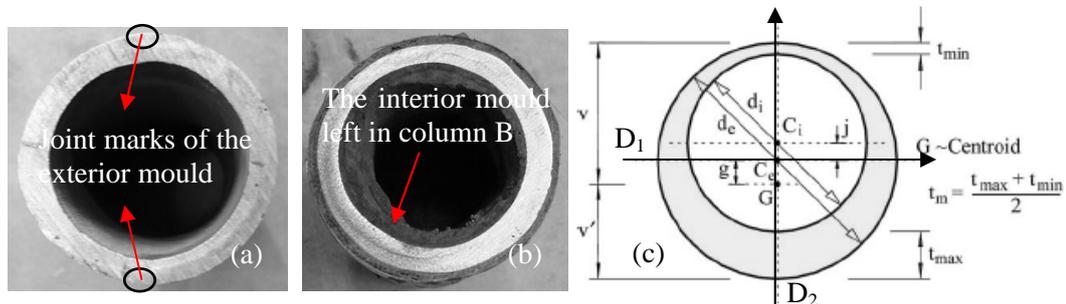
Imperfections in cross-sections: (a) Column A's cross-section, (b) Column B's cross-section, (c) Model of cross-section imperfections.
